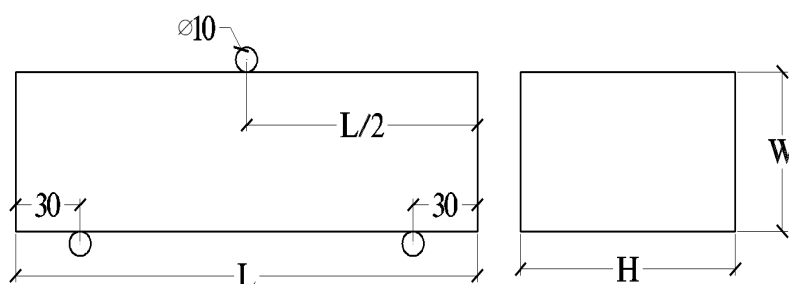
Bending tensile test of concrete brick with smaller bending stiffness (mm)
